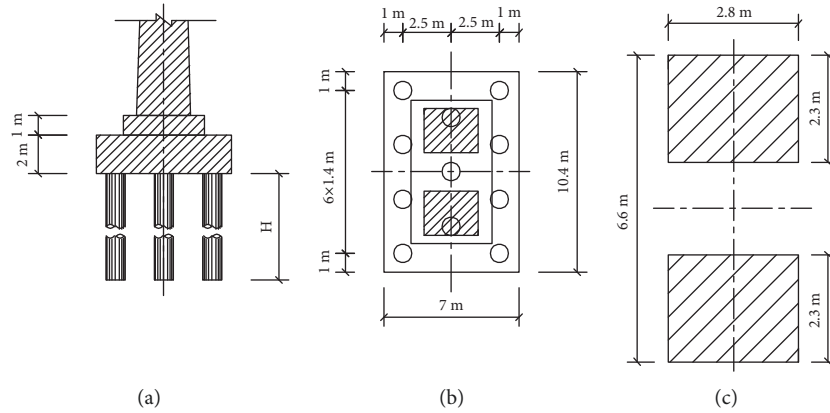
Pier and foundation: (a) cross-section of piers; (b) longitudinal section; (c) overall plan.
